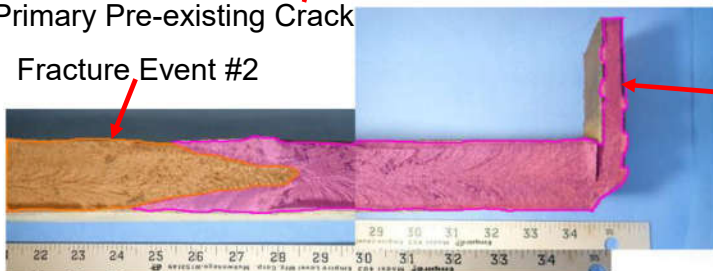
Upper portion of fracture, color-coded to indicate failure sequence.
